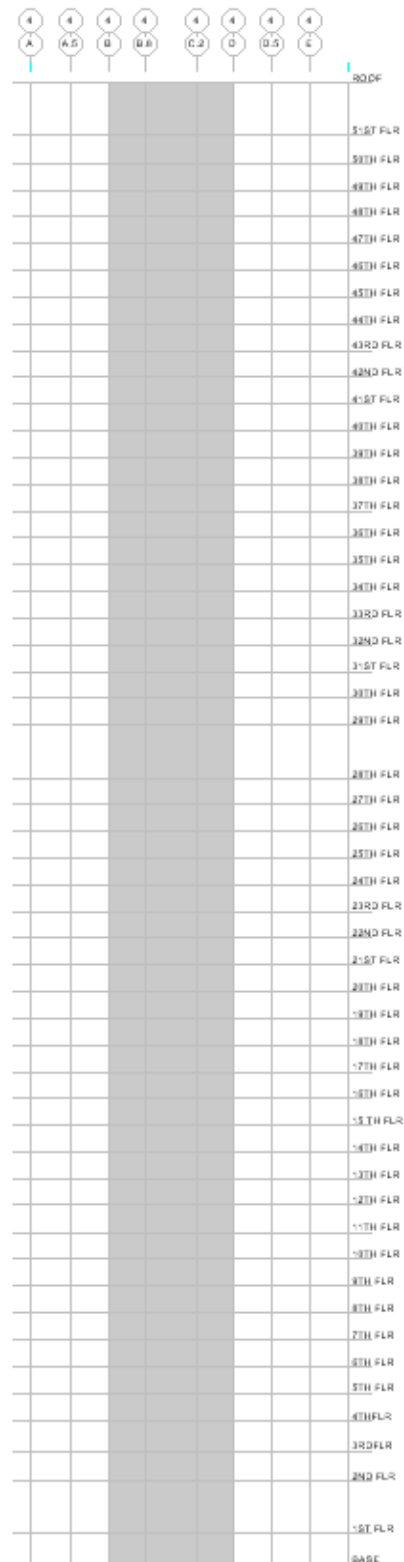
Alternative Lateral System Elevation (Grids 4 & 5)
